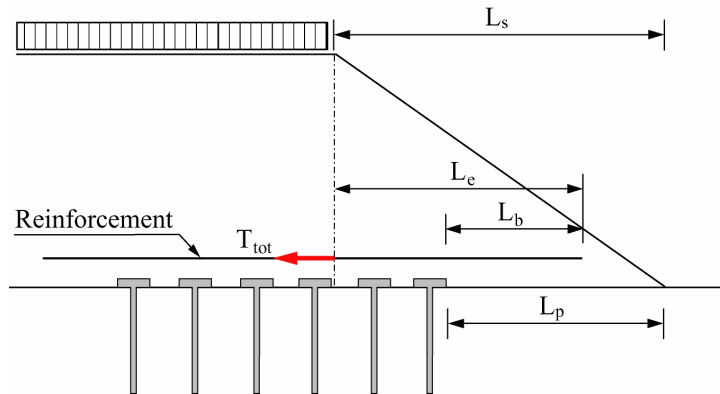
The bond length according to transverse sliding across the bank and the pull-out length of the reinforcement
